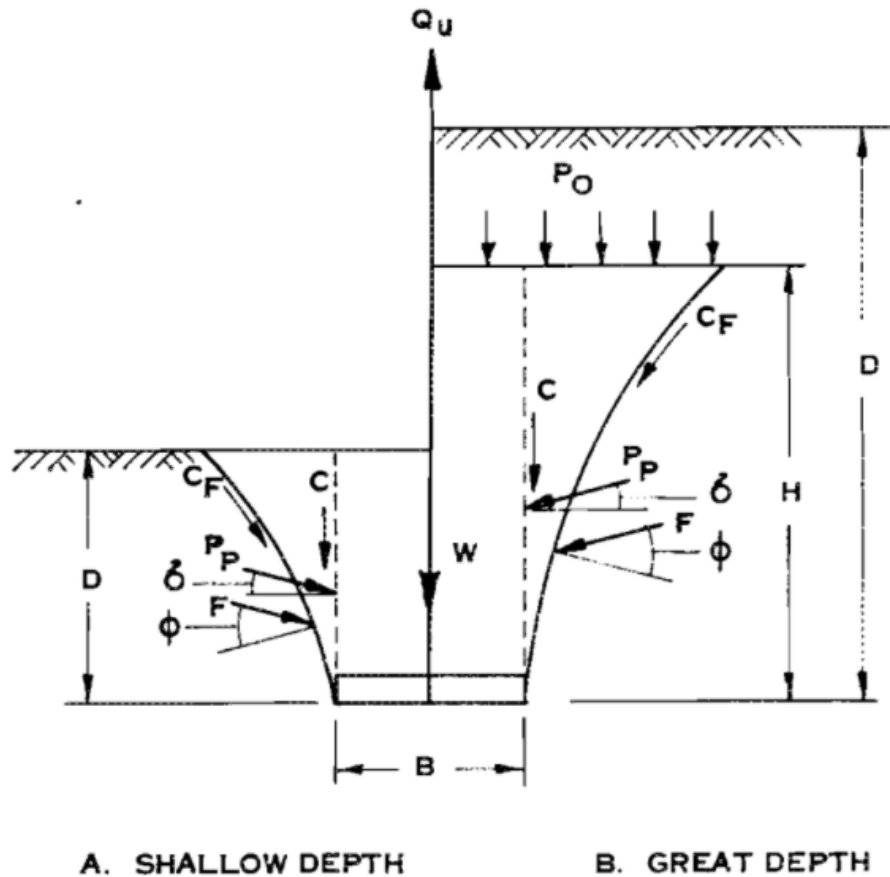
Failure of soil above a strip footing (plate anchor) under uplift load (Meyerhof and Adams, 1968).
